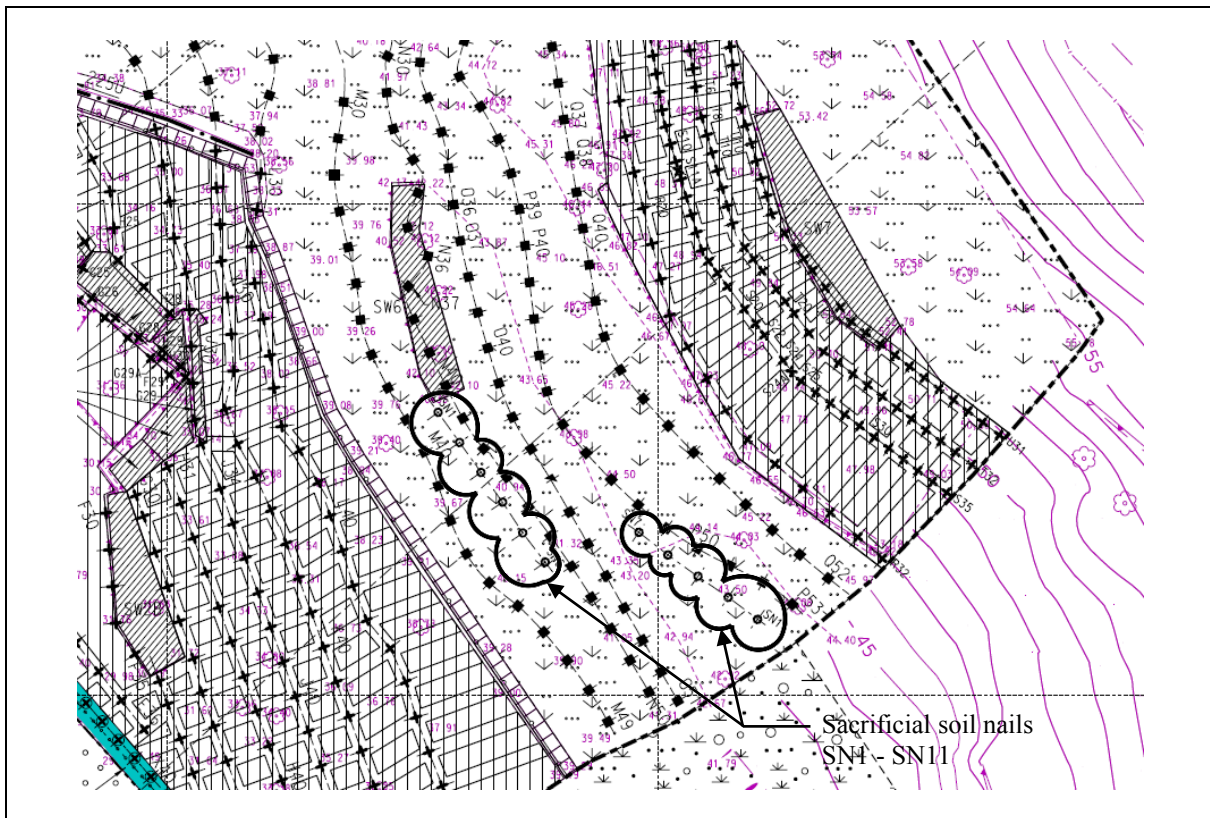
Approximate Locations of Sacrificial Soil Nails at Slope No. 11SW-A/CR595 (sub-division 1) at Belcher's Street
